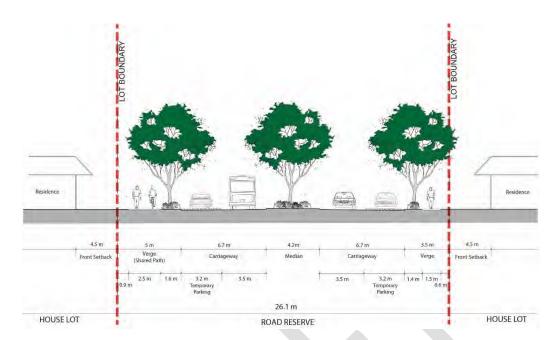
Dransfield Drive Extension Collector Road (Short Term)
